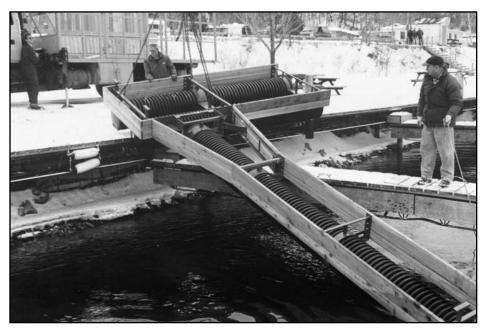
HDPE Pipe Used for Floating Dock Construction
